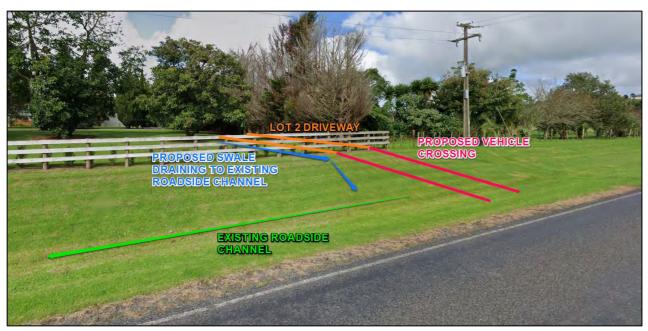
Annotated Site Photo Showing Proposed ROW Swale Discharge Point on Te Ahu Ahu Road.
